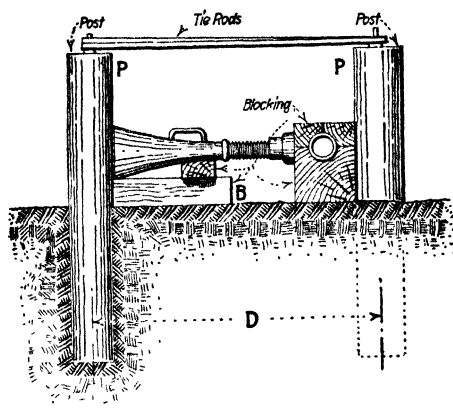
Sectional elevation of the bending arrangement of Fig. 213.
